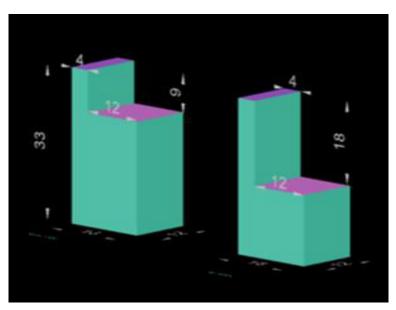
Dimension of building is 16mX12m in plan and 33m Height.
